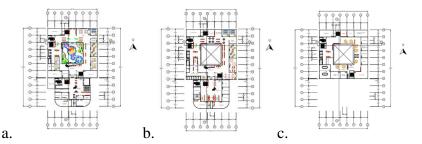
a. First Floor; b. Second Floor; c. Third Floor (Pribadi, 2024)
